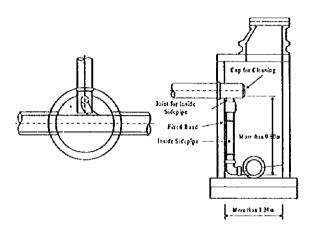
Manhole Structure with a Side-pipe Inside
